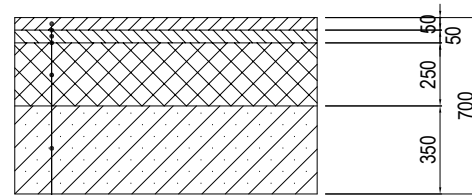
DETAIL OF ASPHALT CONCRETE PAVEMENT S=1:30
